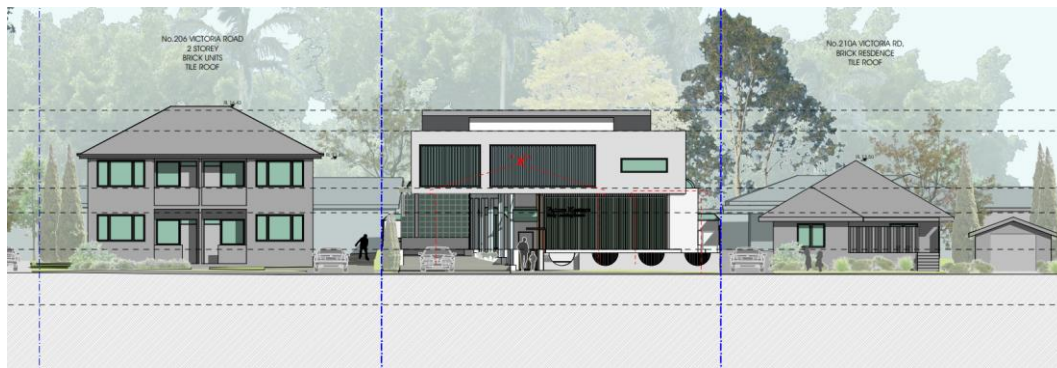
Extract of western street elevation fronting Victoria Road, Punchbowl (Source: Design Building Group, 2023).
